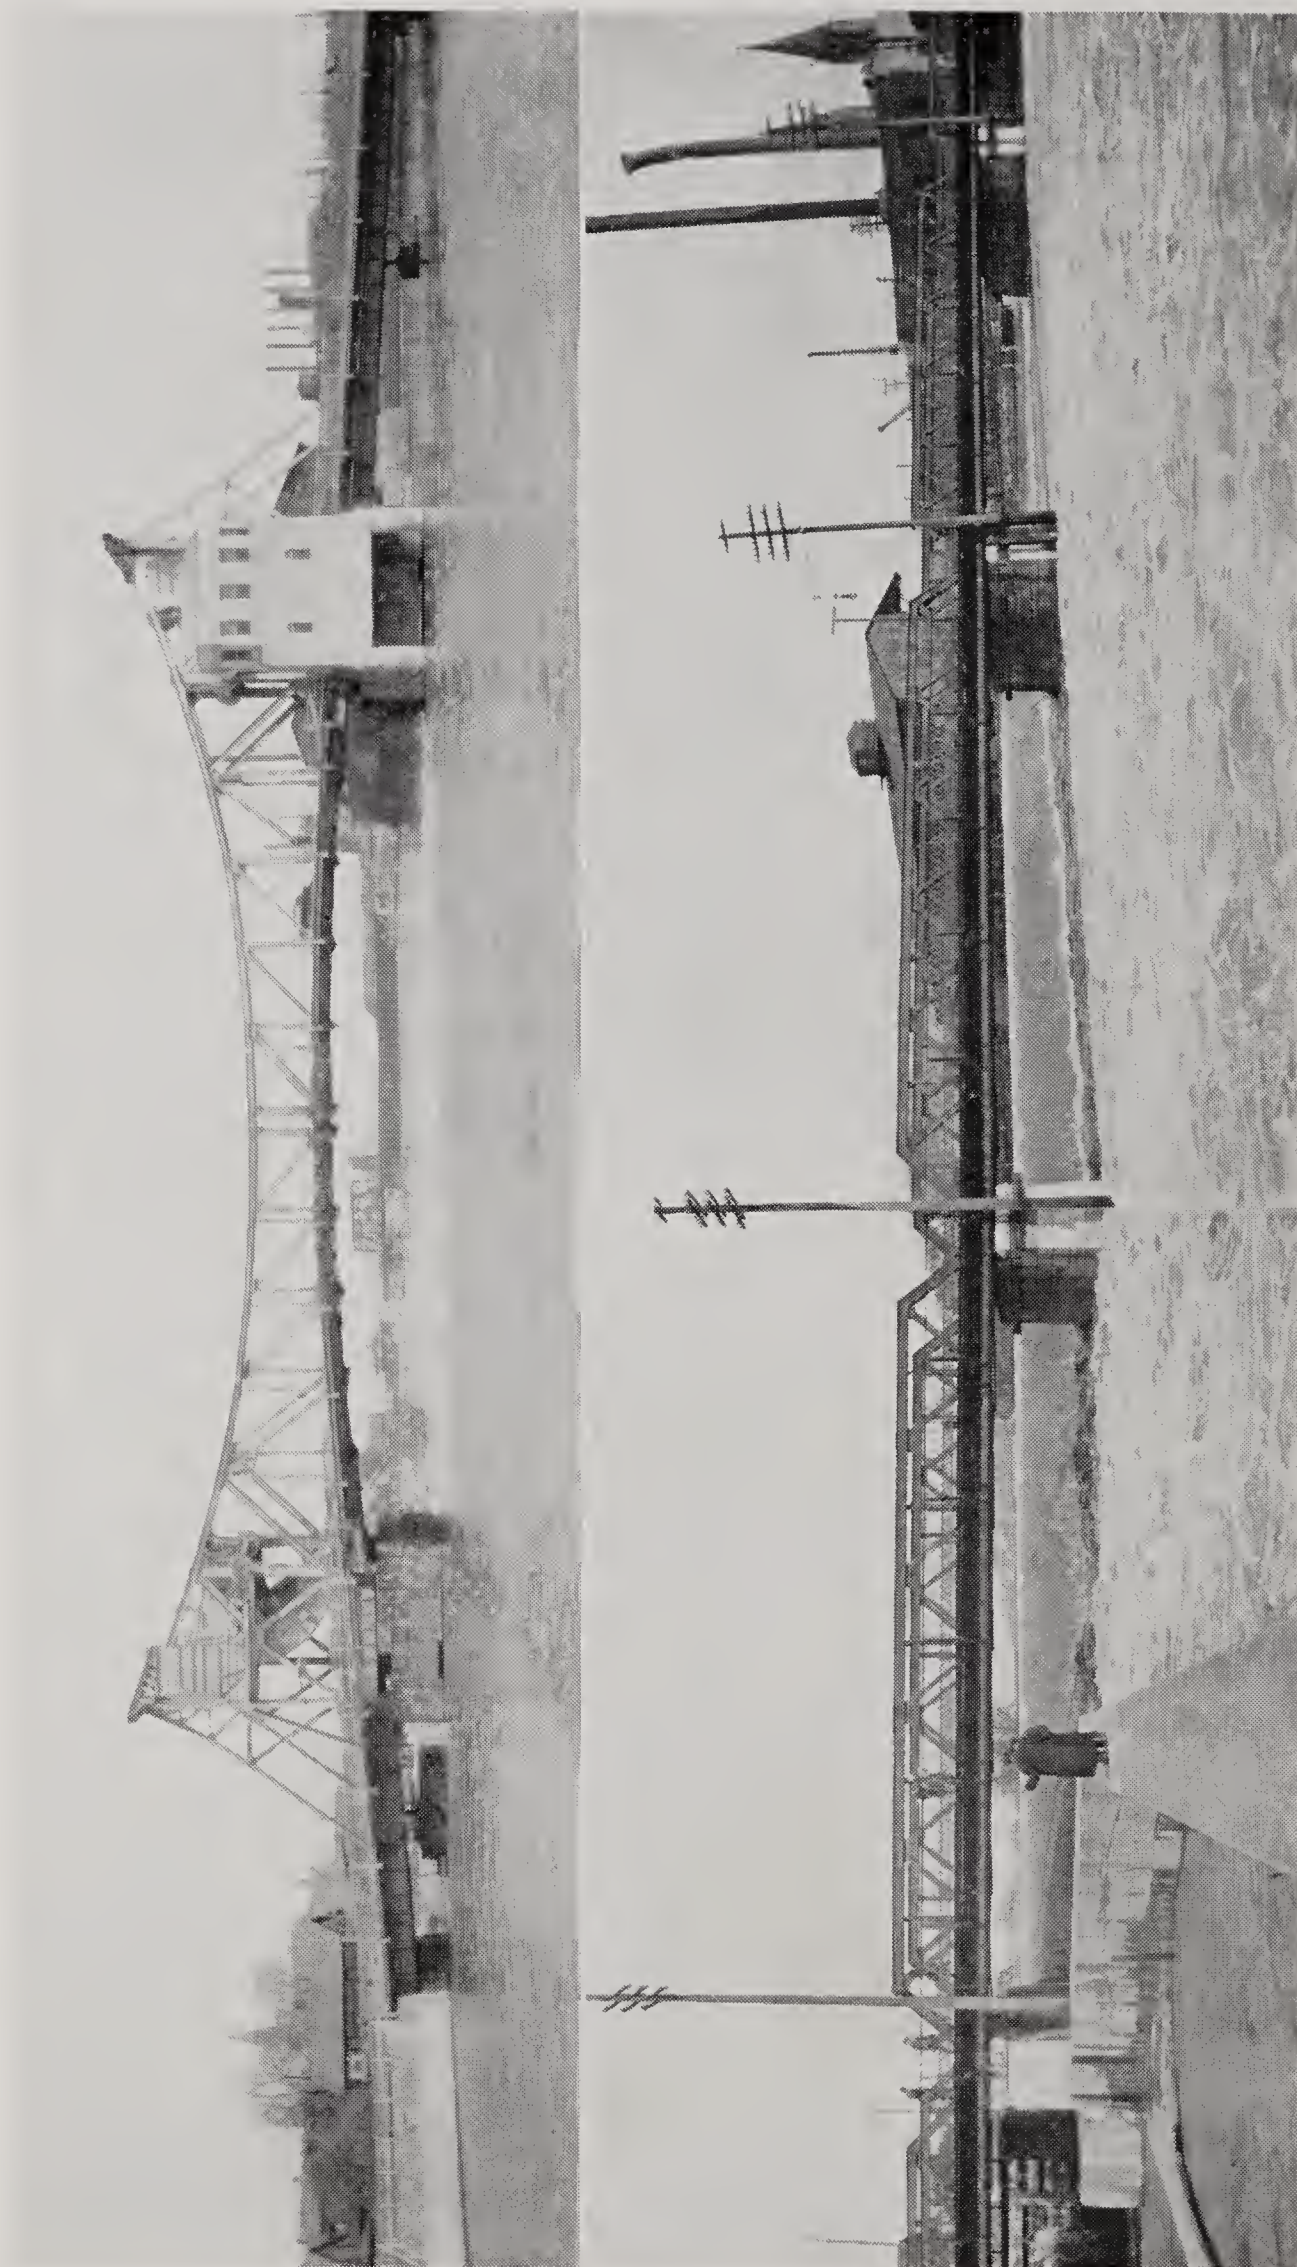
View showing the old and new Jackson Street Bridge and the Illinois and Michigan Canal water power development which was destroyed by the new pool elevation at Joliet.
